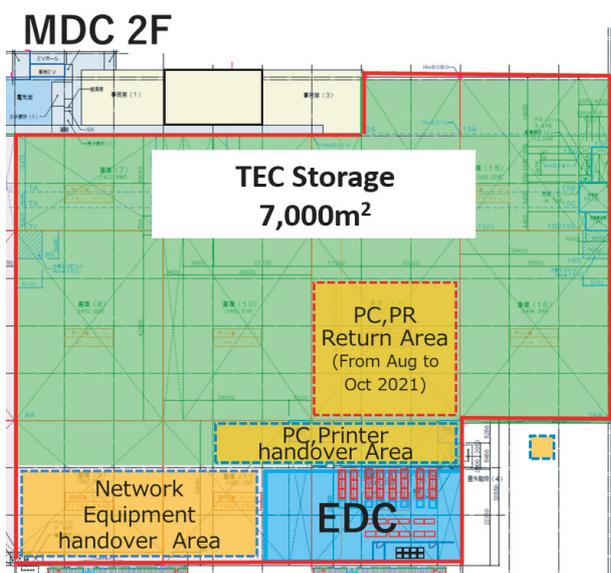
Floor Layout Around the EDC on the Second Floor of MDC
